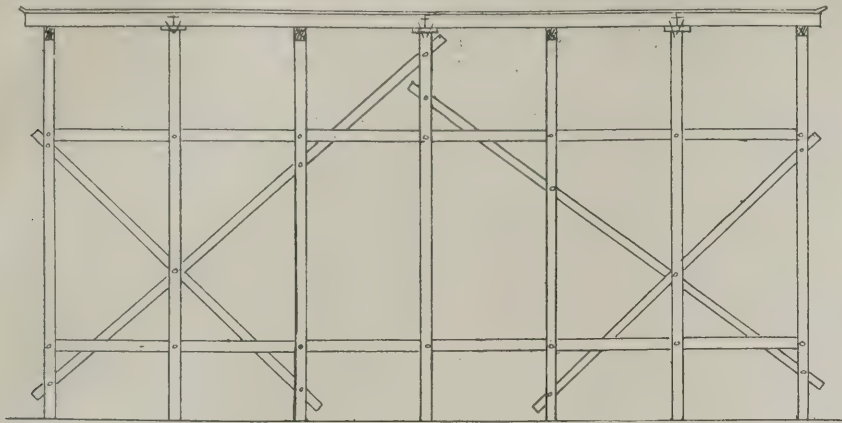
DERRICK STAGING TO CARRY TRAVELLING CRANE: FRONT ELEVATION.
